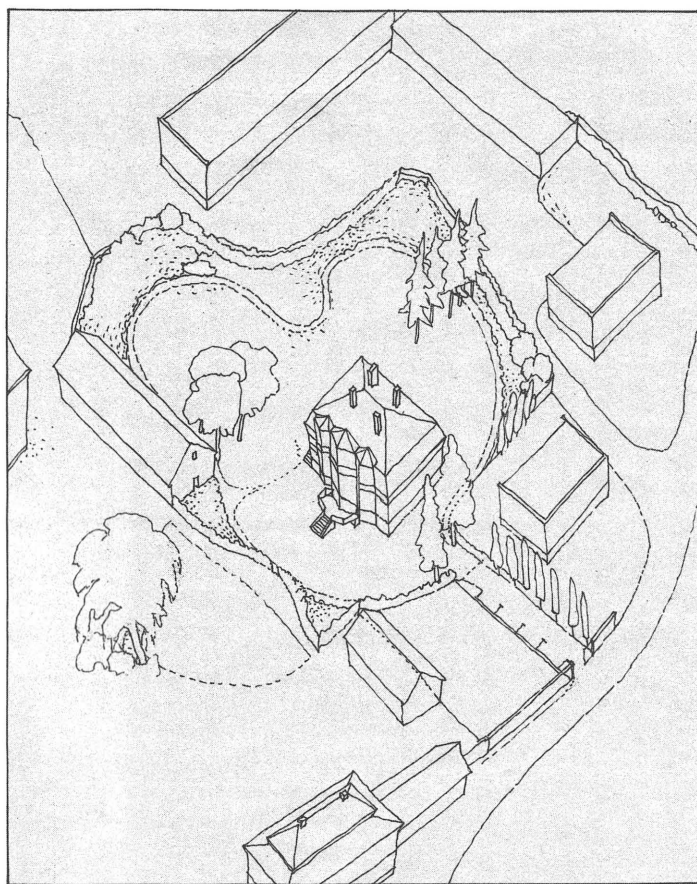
Josef Gočár, Adolf Bauer Villa, 1912–1914, Libodřice, building reconstruction proposal by architect Michal Sborwitz
